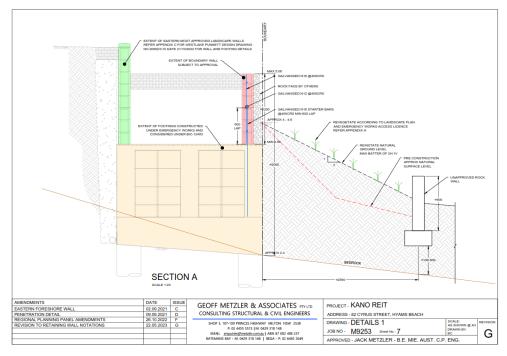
Extract from plans noting the extent of proposed seawall (red) that is being considered by this application
